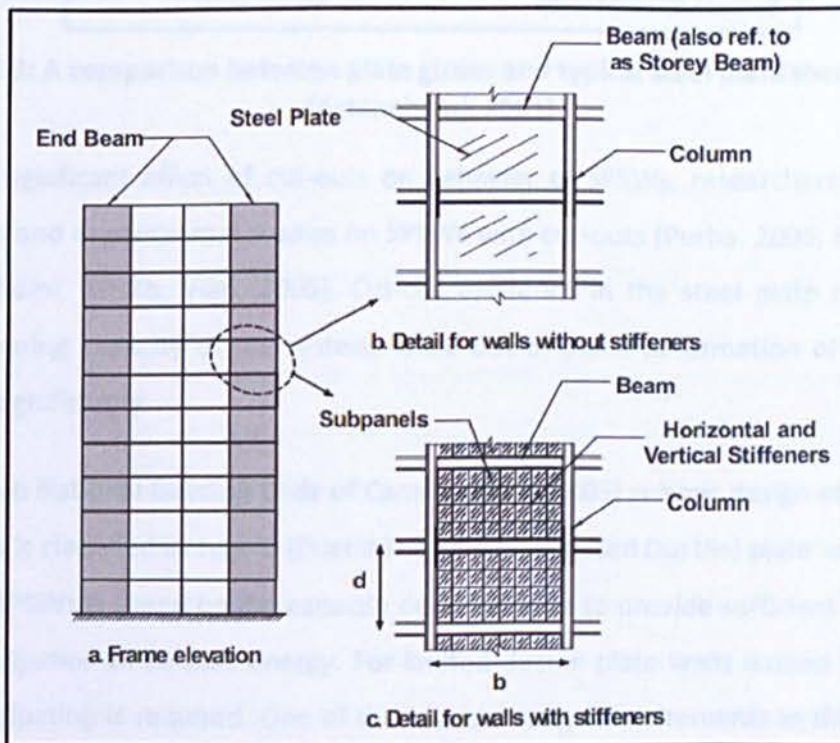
Scheme of steel plate shear wall with details depicting an un-stiffened steel plate and steel plate with multiple stiffeners (From Kharrazi, 2005)
